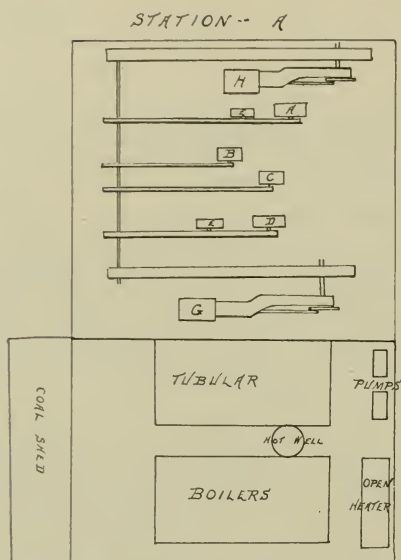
A, D, Westinghouse Alternators; B, C, Weston Arc Dynamos; E, E, Exciters; G, Allis Corliss Engine; H, Auxiliary Corliss Engine.
